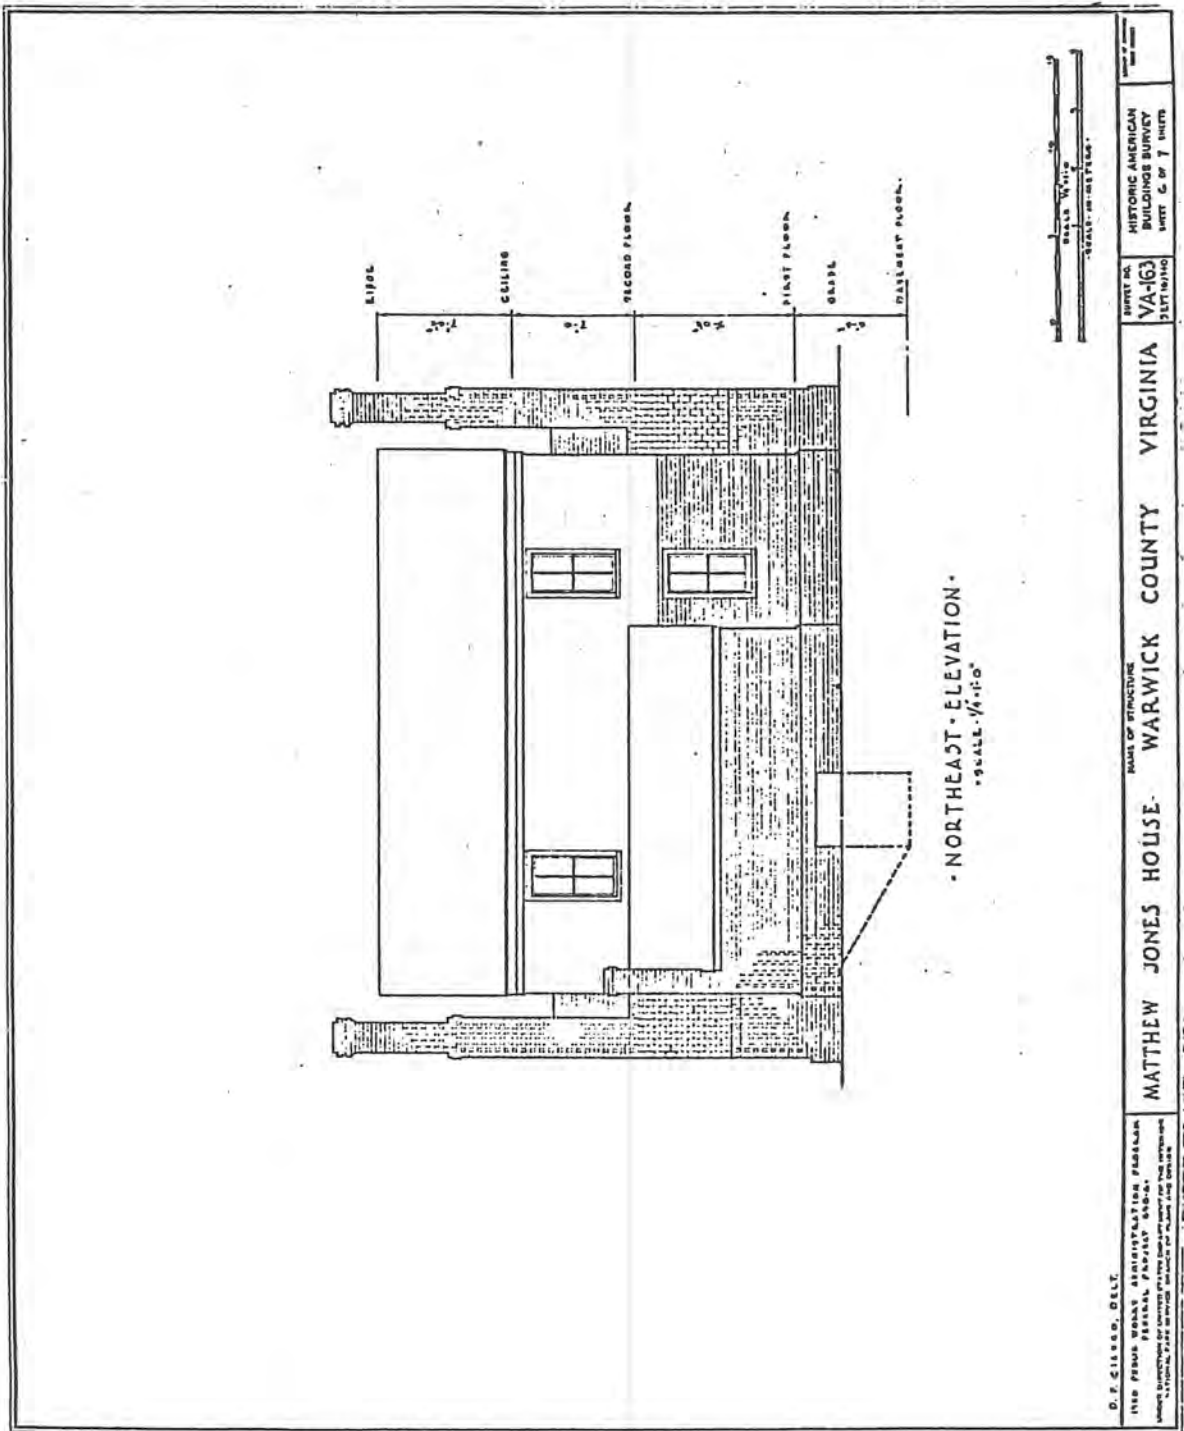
Matthew Jones House, HABS drawing (1940), northeast elevation.
